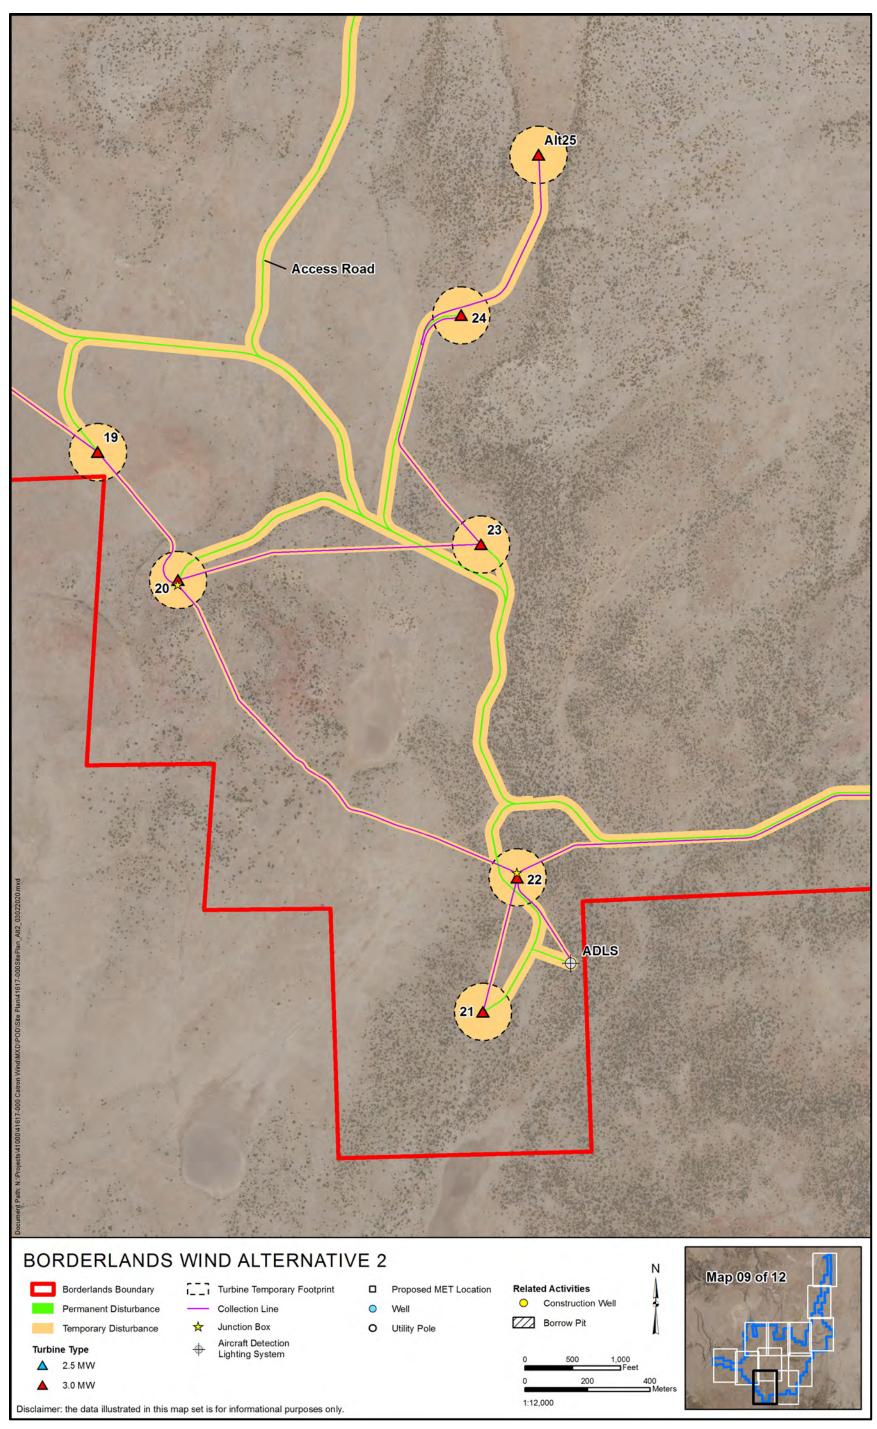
Alternative 2 Site Plan (Map 9 of 12)
